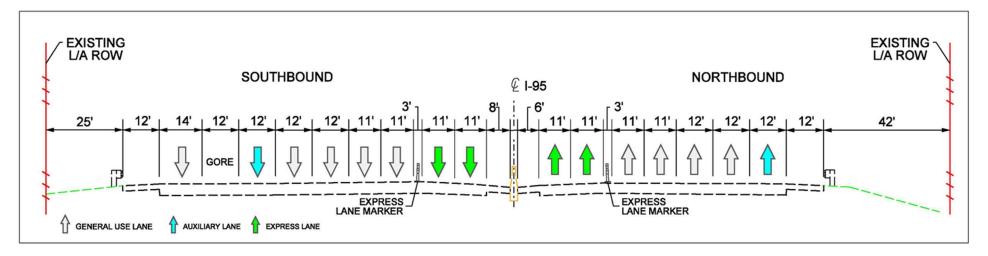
I-95 No-Build/No Action Alternative Roadway Section North of Hallandale Beach Boulevard
